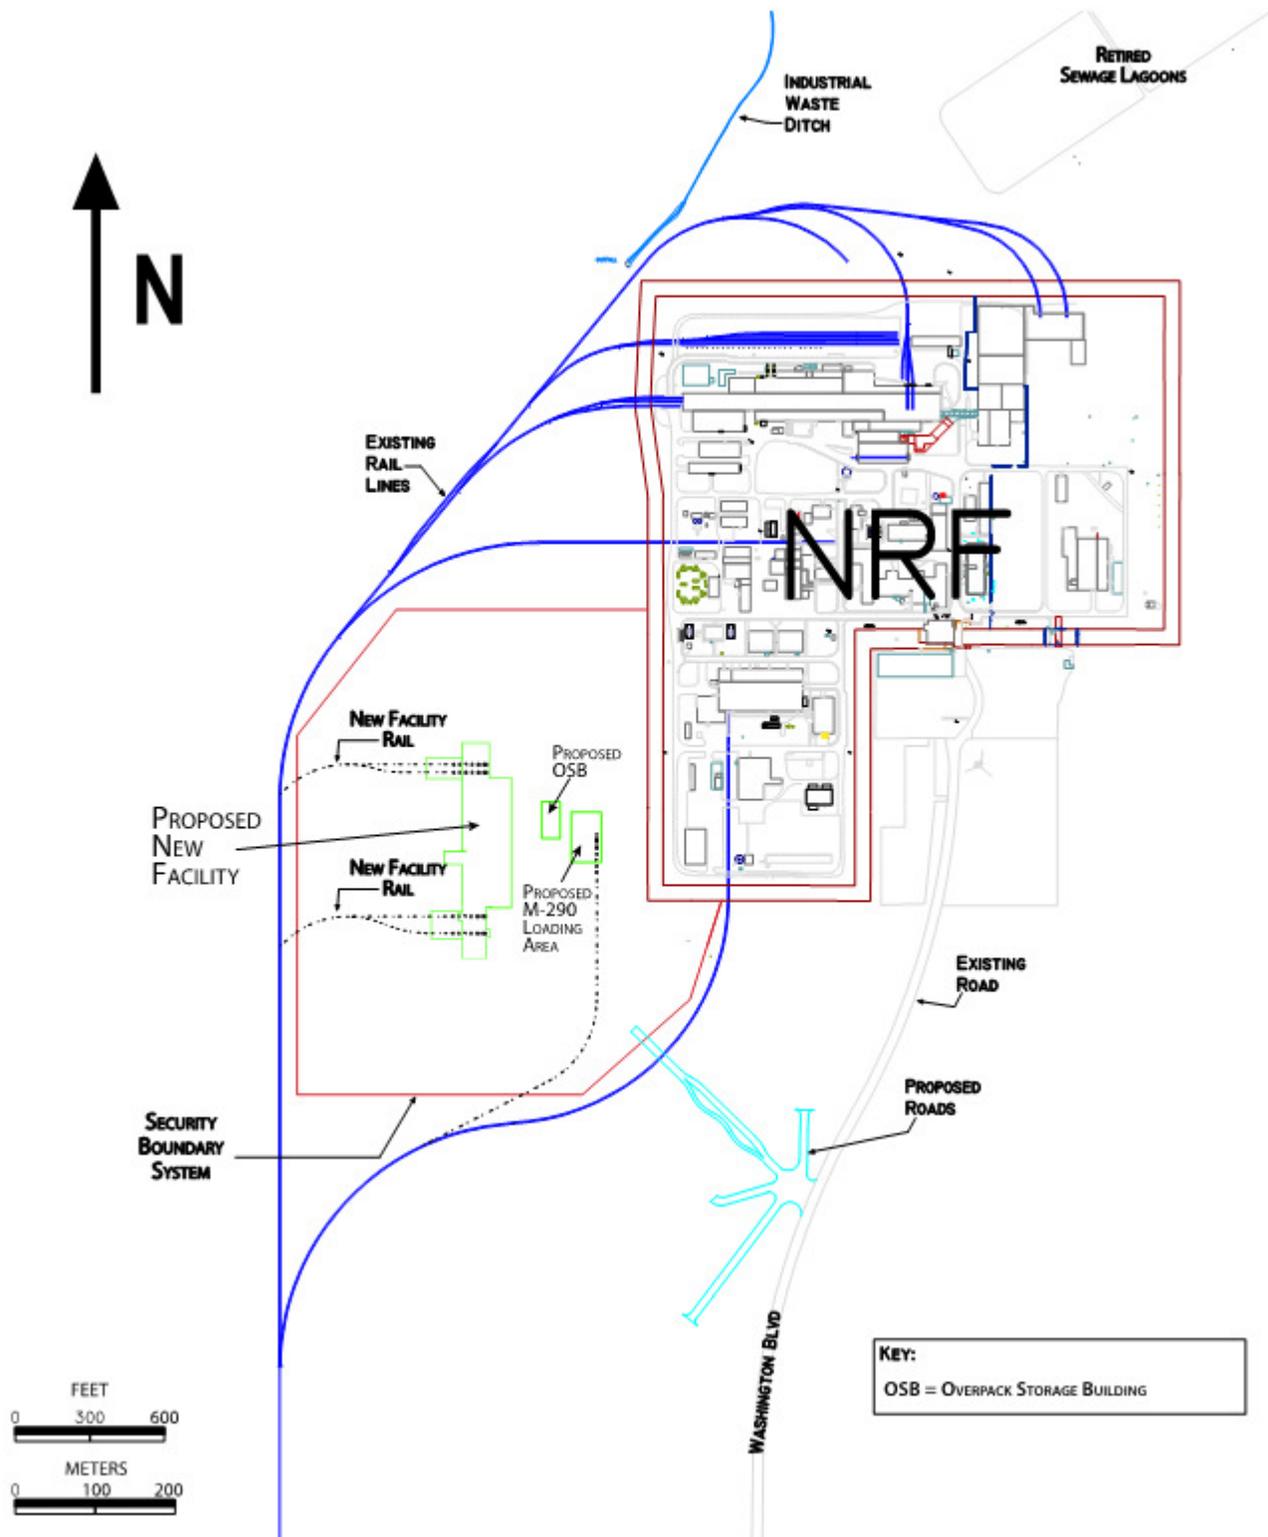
Conceptual Site Layout for Proposed New Facility at Location 6
